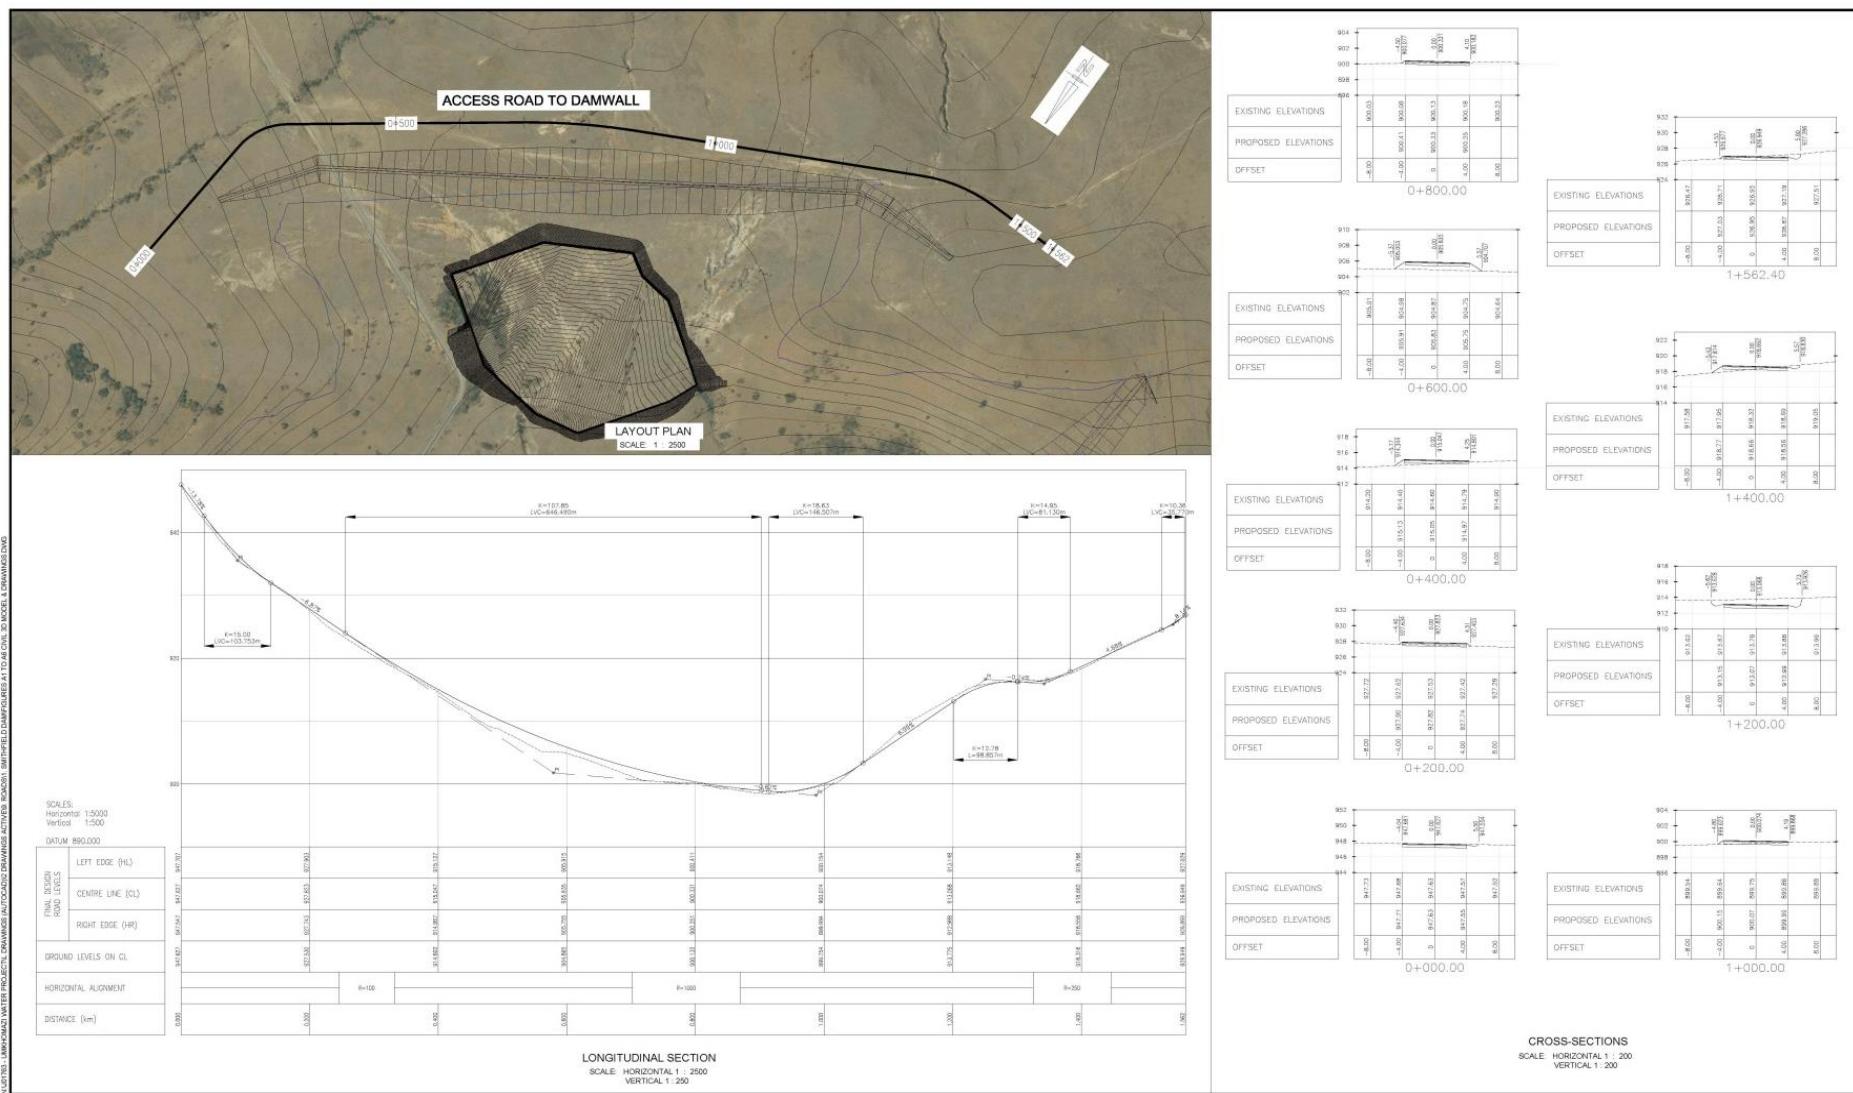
C.6: Smithfield Dam – Layout plan, longitudinal section and cross sections of access road to damwall
